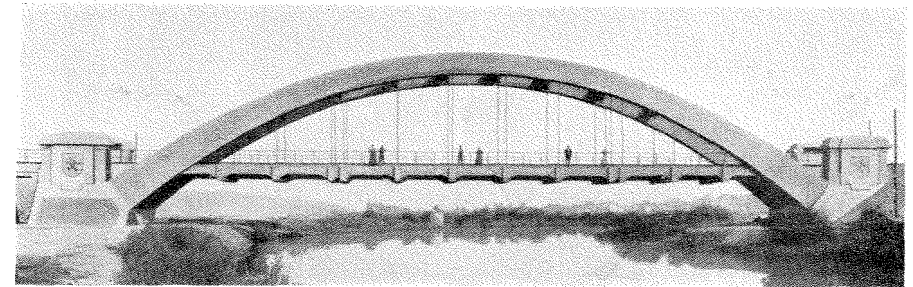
Railway Bridge, Thuringen, Germany. Built in 1910.
